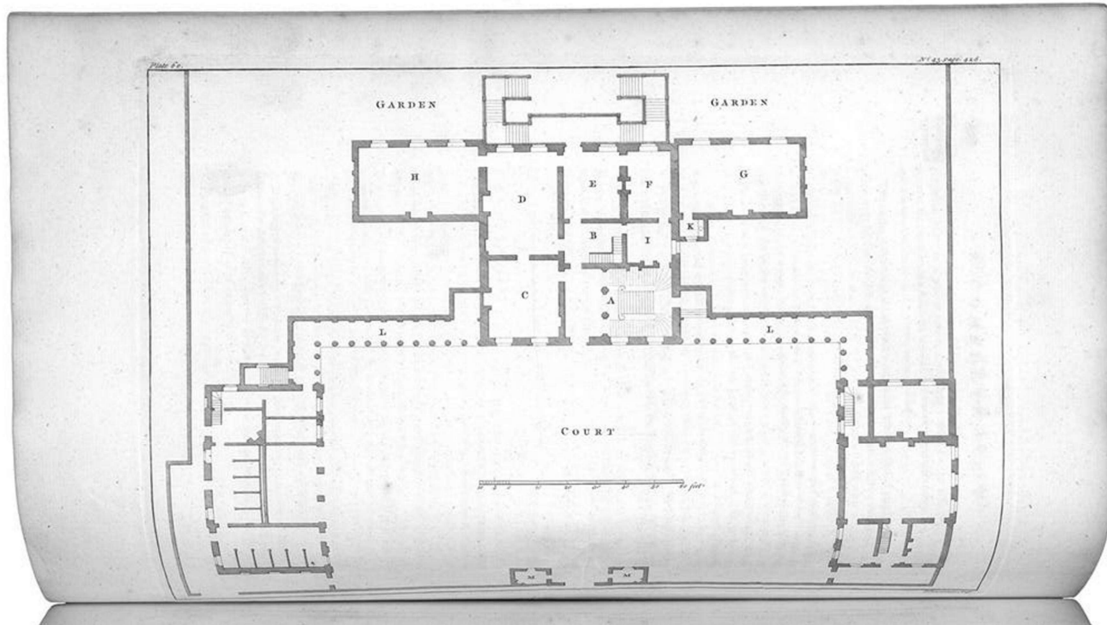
Isaac Ware, *Ground floor plan of Chesterfield House*, in *A Complete Body of Architecture. Adorned With Plans and Elevations...* 1755-7, Osborne and Shipton, p. 60-88 courtesy of Getty Research Institute
